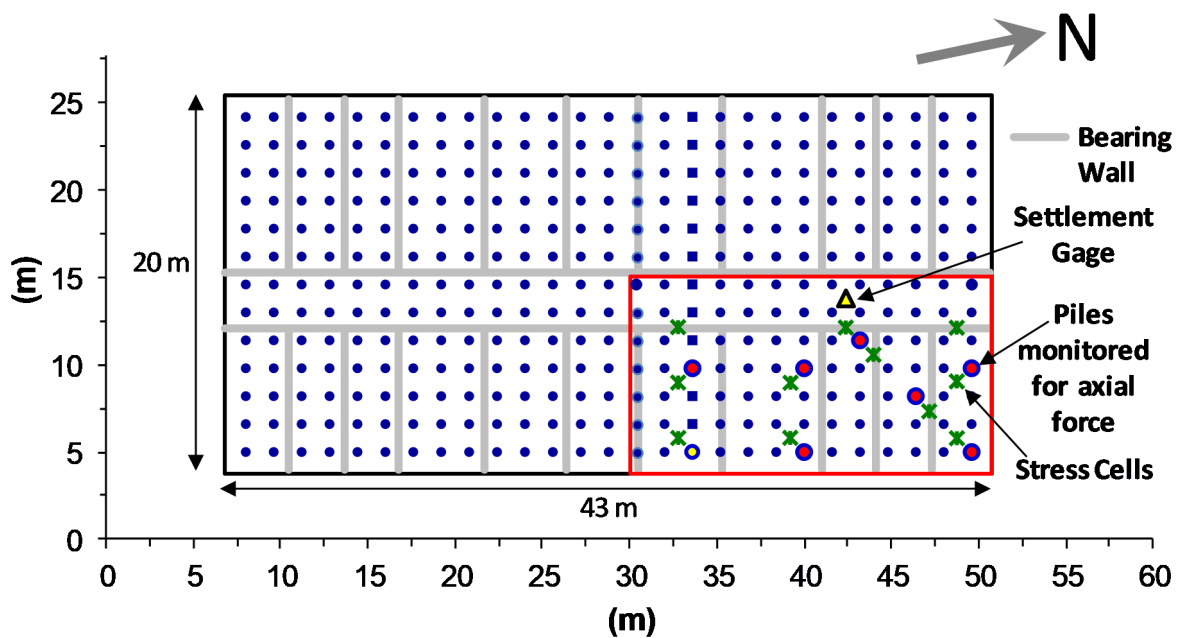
Raft plan with bearing walls and piles (After Cooke *et al.*, 1981)
